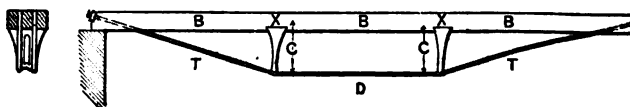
Trussed Wooden Girder. Two Vertical Struts
